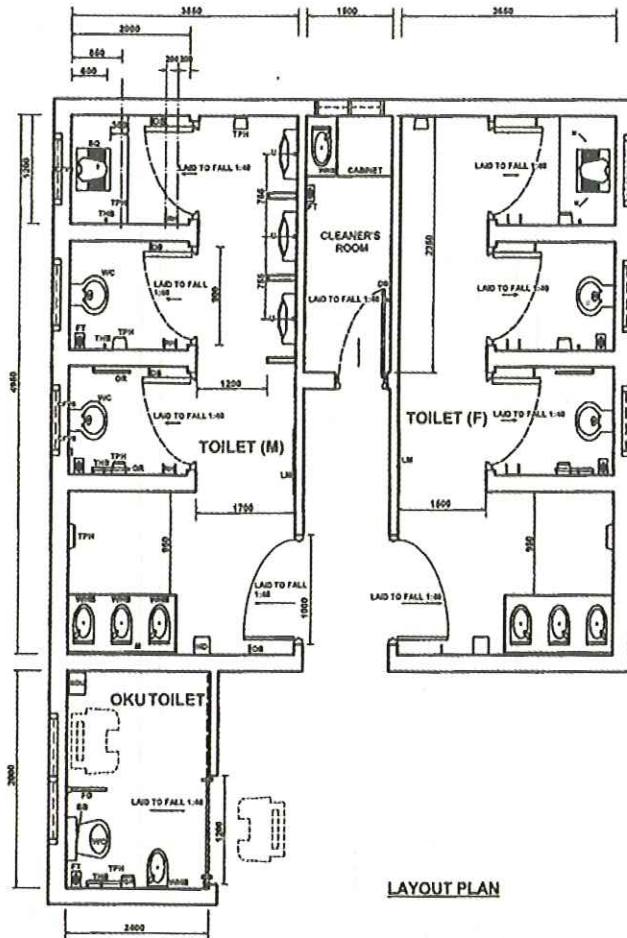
Male, female, cleaner's room and accessible toilet - Layout plan
